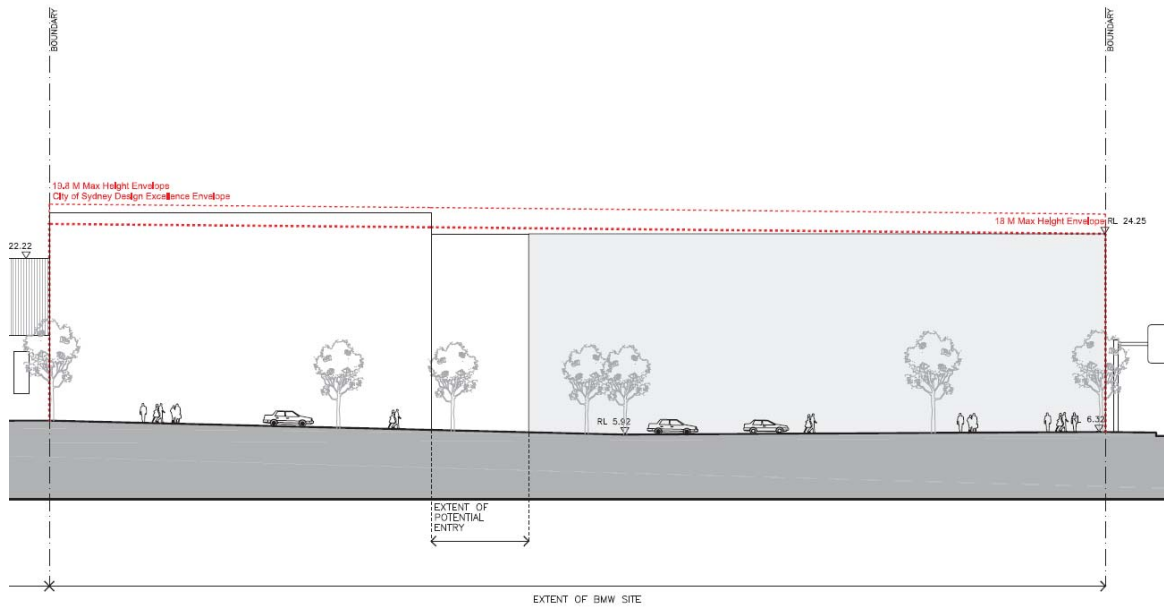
Proposed eastern elevation (McLachlan Avenue)
